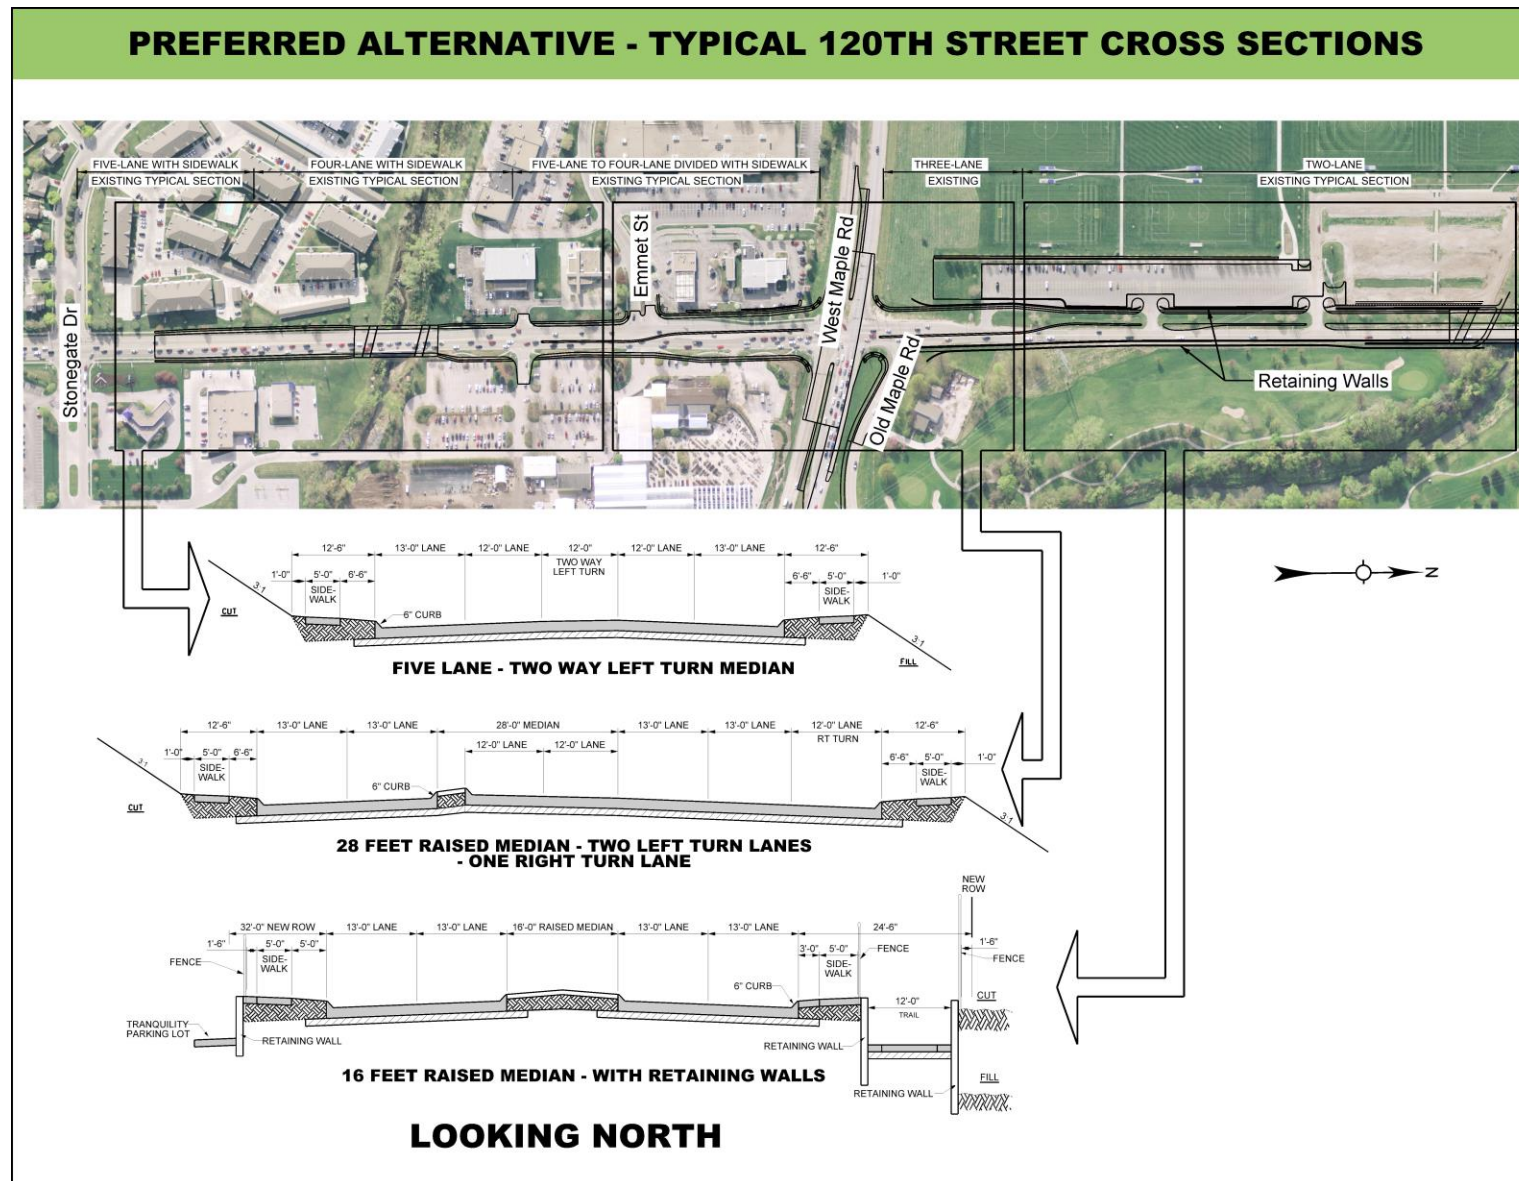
A. Preferred Alternative – Typical 120th Street Cross Sections
